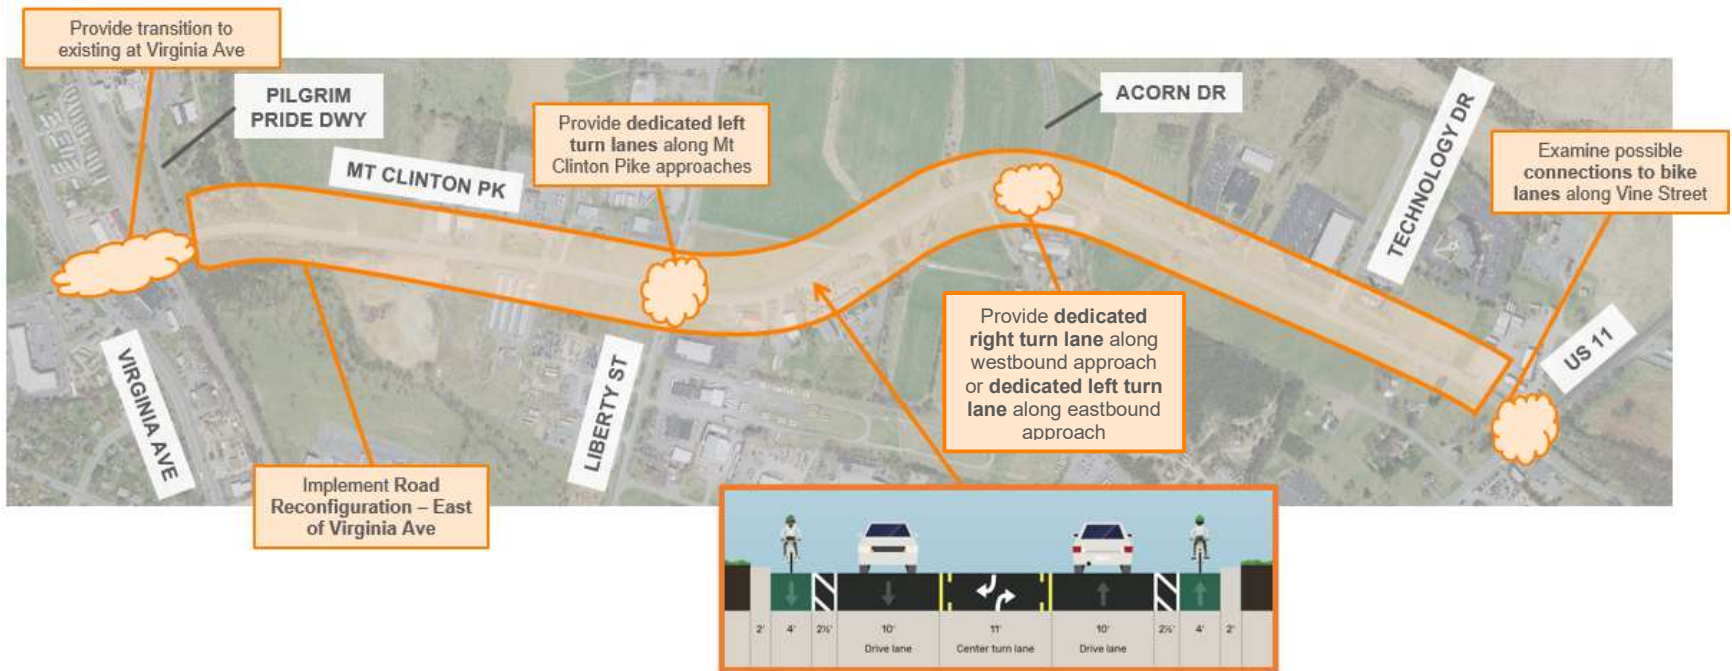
Mt. Clinton Pike - Recommended Improvements Layout
